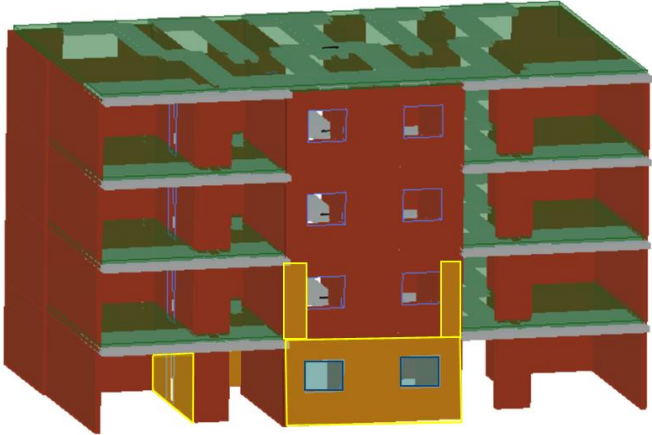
Elevation showing the seismically retrofitted walls (yellow) visible from the exterior (54.2 m², NSM steel reinforcement)
